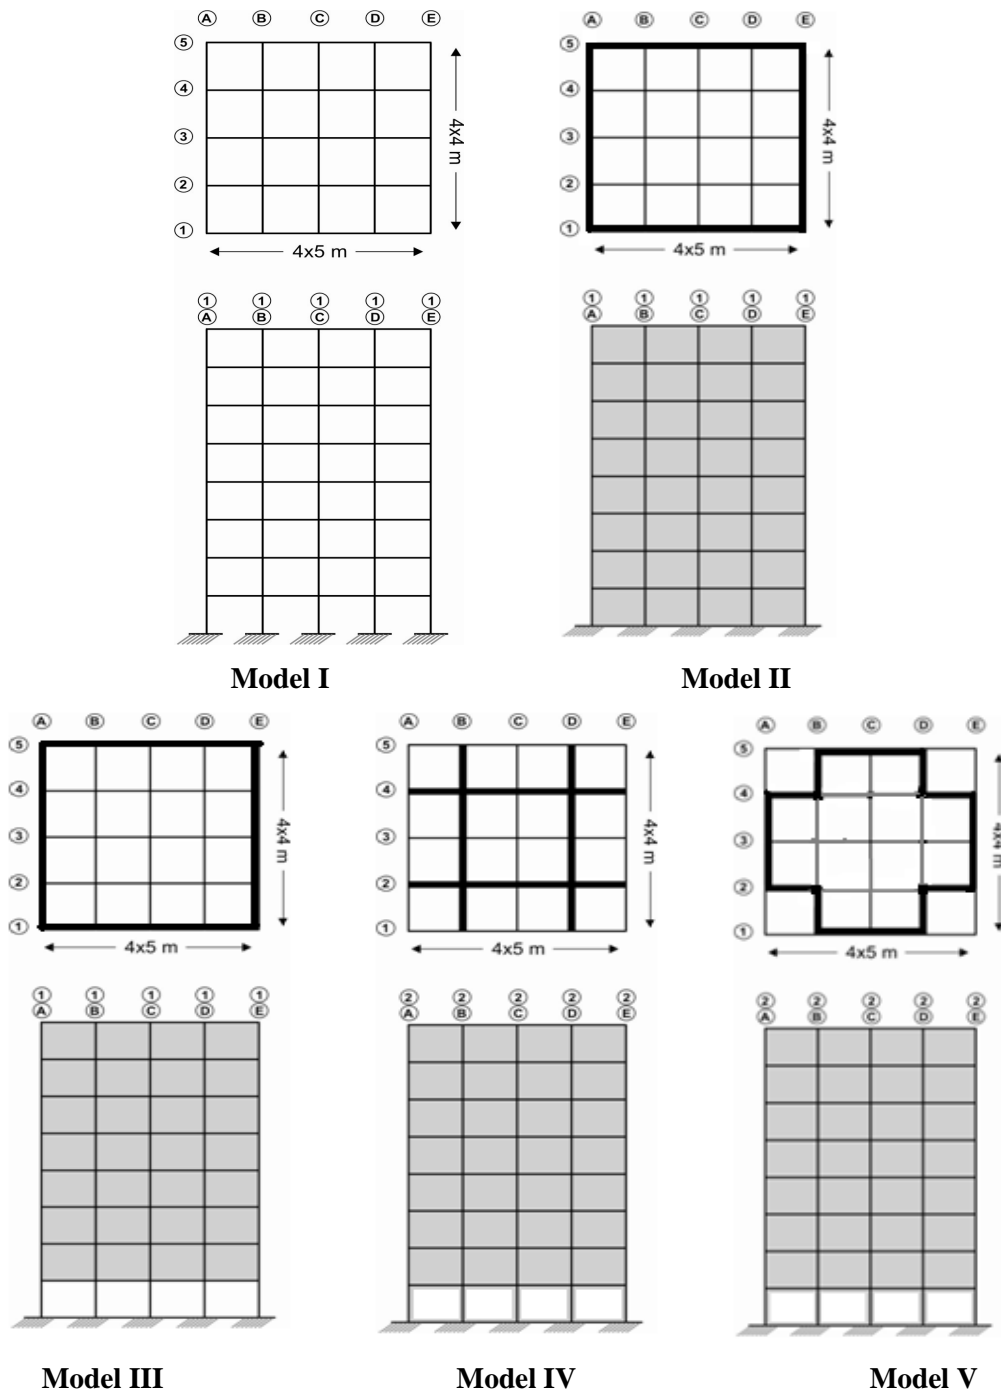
Plan and Elevation of Eight Storeys Reinforced Concrete Building
